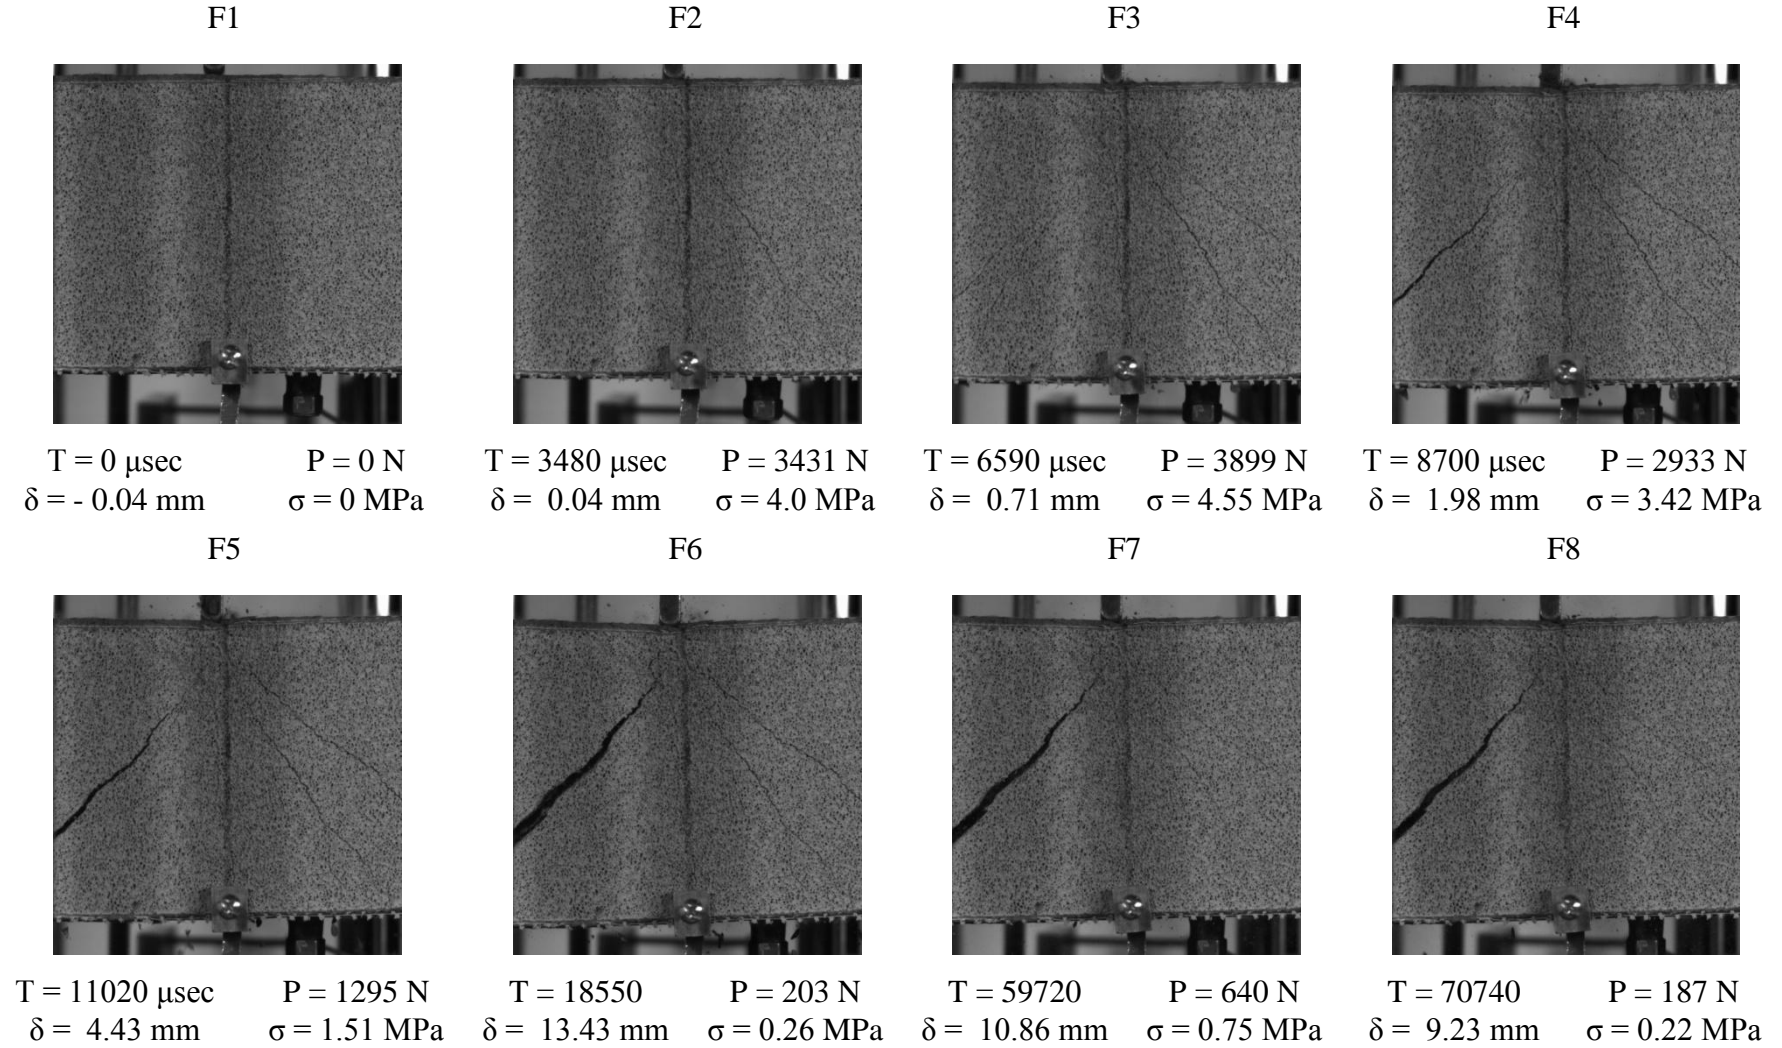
(b) : Crack propagation of SWFRAC-B beam under impact loading (Drop Height = 300 mm)
